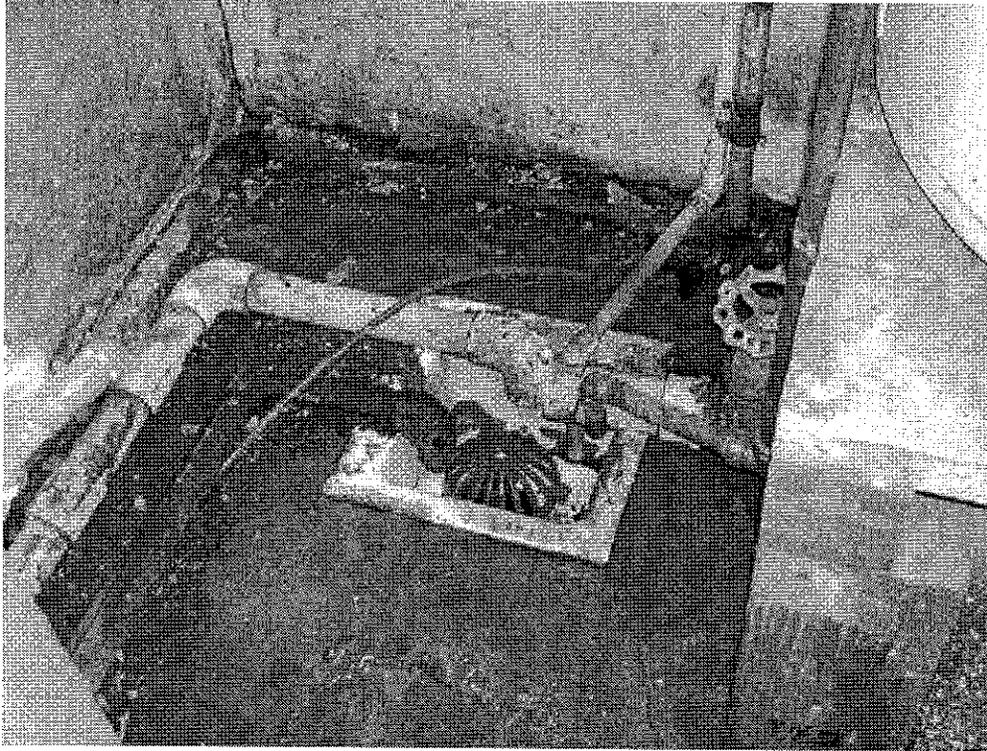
View of sink/drain area during 5-gallon pour test. Note crack on lower right side of photo does not have free water (water has infiltrated into crack).
